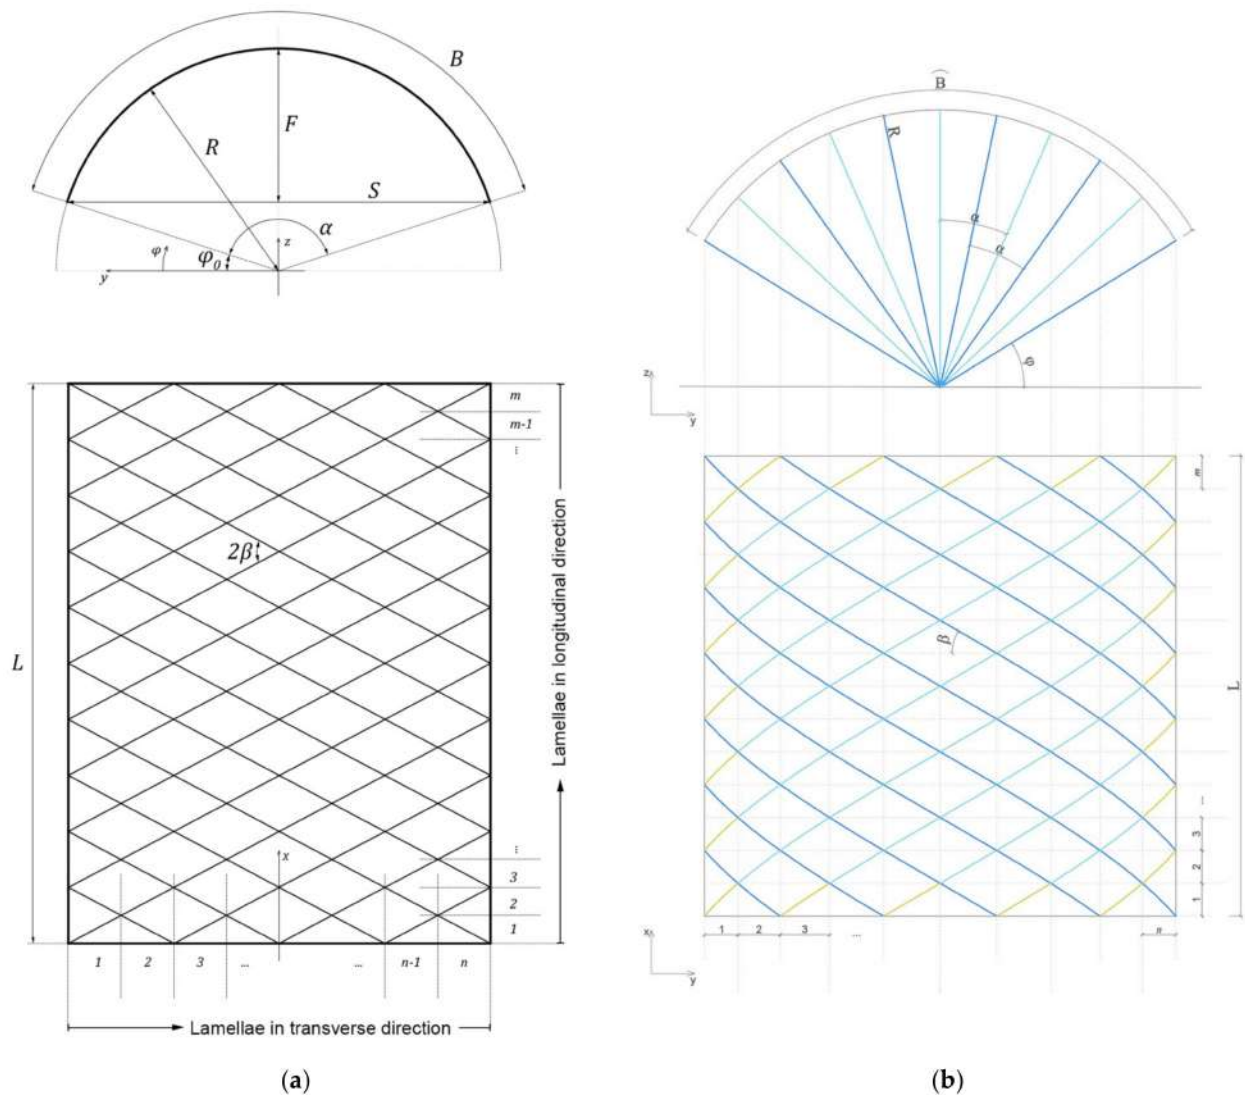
Floor plan and section of the lamella vault for geometrical analysis (a) by Tutsch [13]; (b) by the authors.
